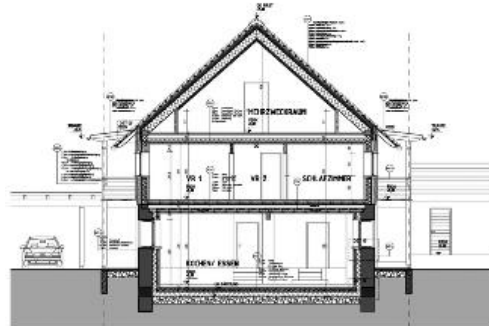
Cross section. Internal insulation on the ground floor and in the column free passive house loft.
